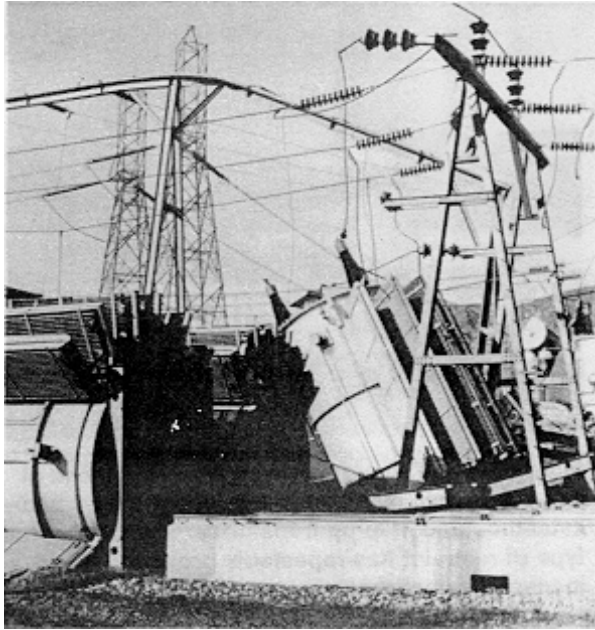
Failure of rail-mounted transformers restrained by chocks. Five of the six single-phase transformers fell from their supports, damaging radiators, bushings, and the bus support structure. Chocks clamped to the rails could not restrain the transformers. Restoration is lengthy and expensive. Note that the carriages on the 2nd and 3rd transformers separated from their transformers
